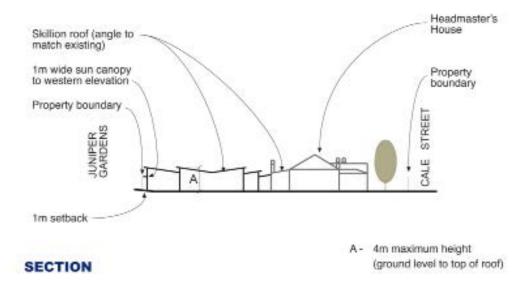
SITE J SITE SPECIFIC PLAN
